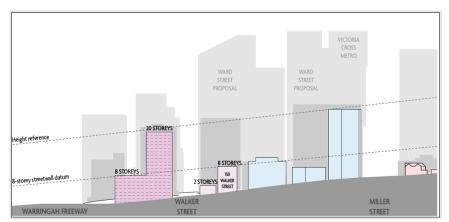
Schematic section diagram showing the proposed stepping heights principle
